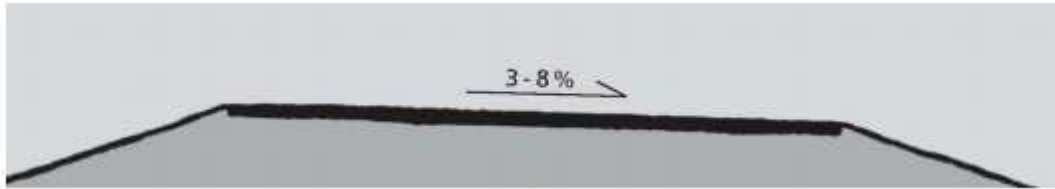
Superelevation (one-sided cross fall) between 3-8% (NPRA, 2014b, p. 37).
